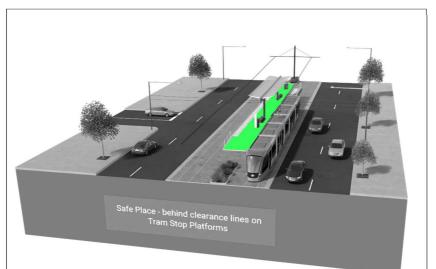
Example of Safe Places on Tram Stop Platforms – Shared Tram Corridor
